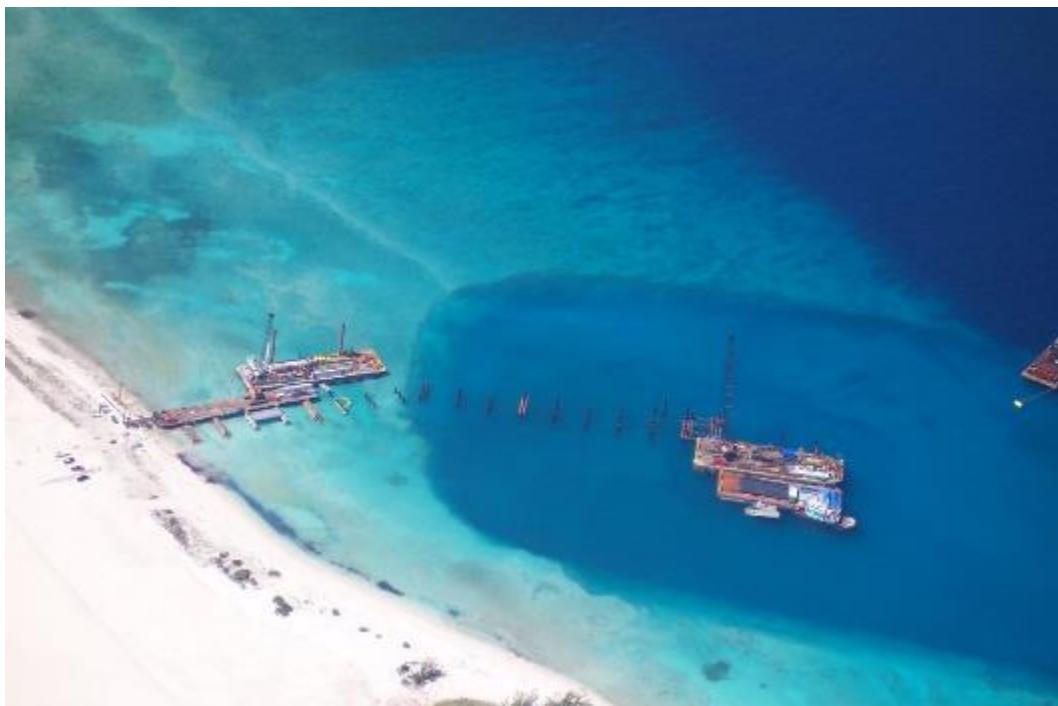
Representative photo of pile driving (Grand Turk Cruise Facility construction)
